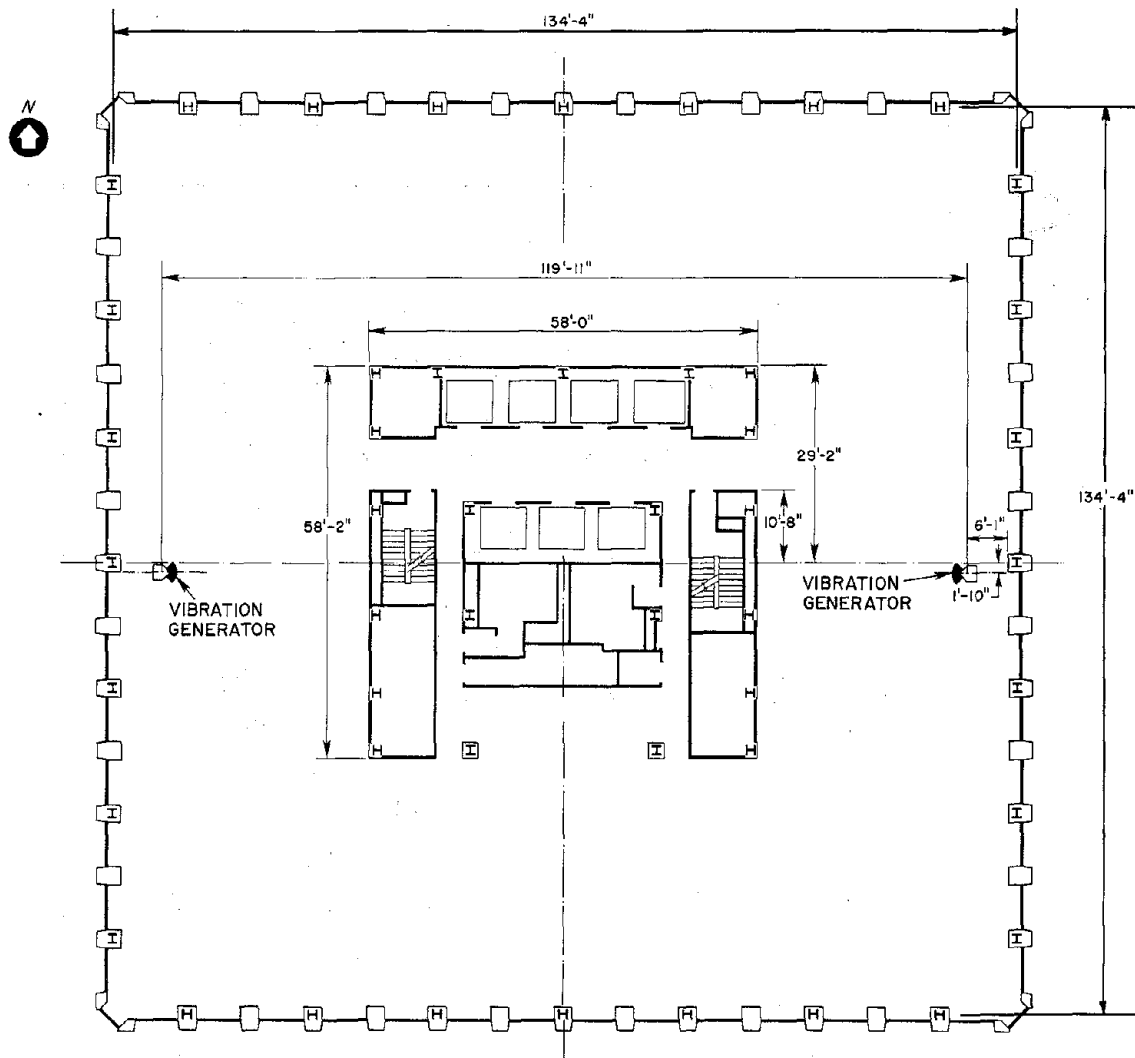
TYPICAL FLOOR PLAN AND LOCATION OF VIBRATION GENERATORS (39th FLOOR)
